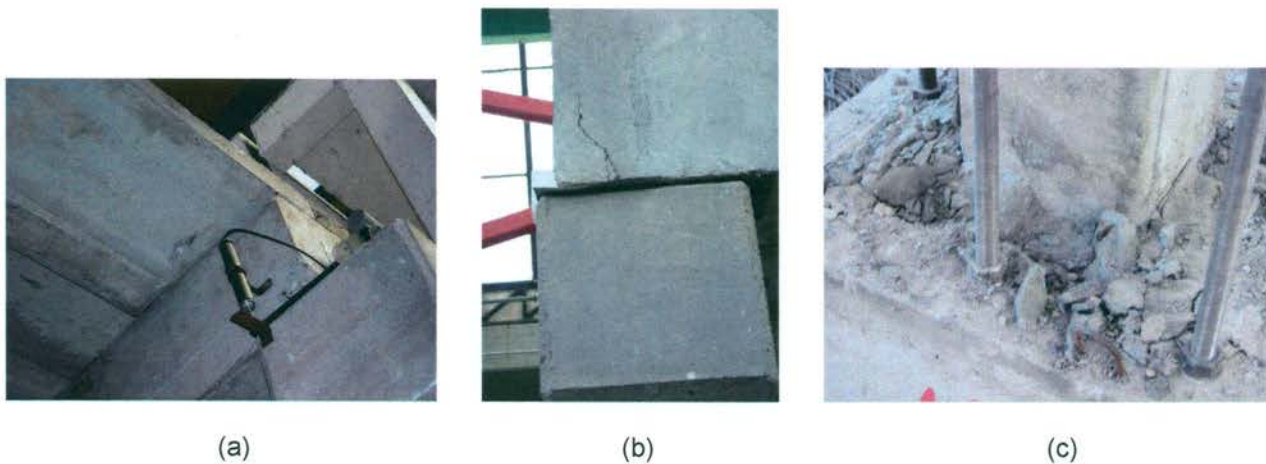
(a) Small damage to beams of specimen 4 due to impact; (b) dislocation and damage to beams of specimen 5; (c) damage to the column-to-footing joints of specimen 5. Both specimens were subjected to a series of base excitations with pga up to approximately 0.8g.
